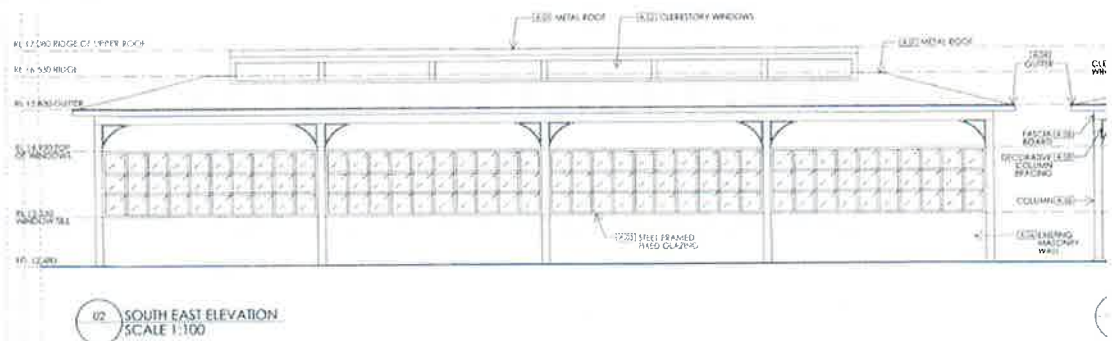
DA approved South East Elevation (Source: Akin Creative).
